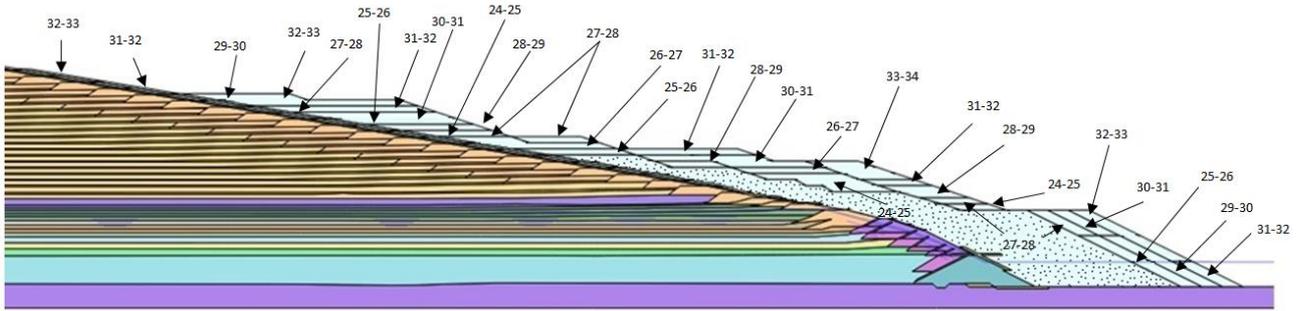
Rockfill plan for future raisings at the studied dam E-F.
